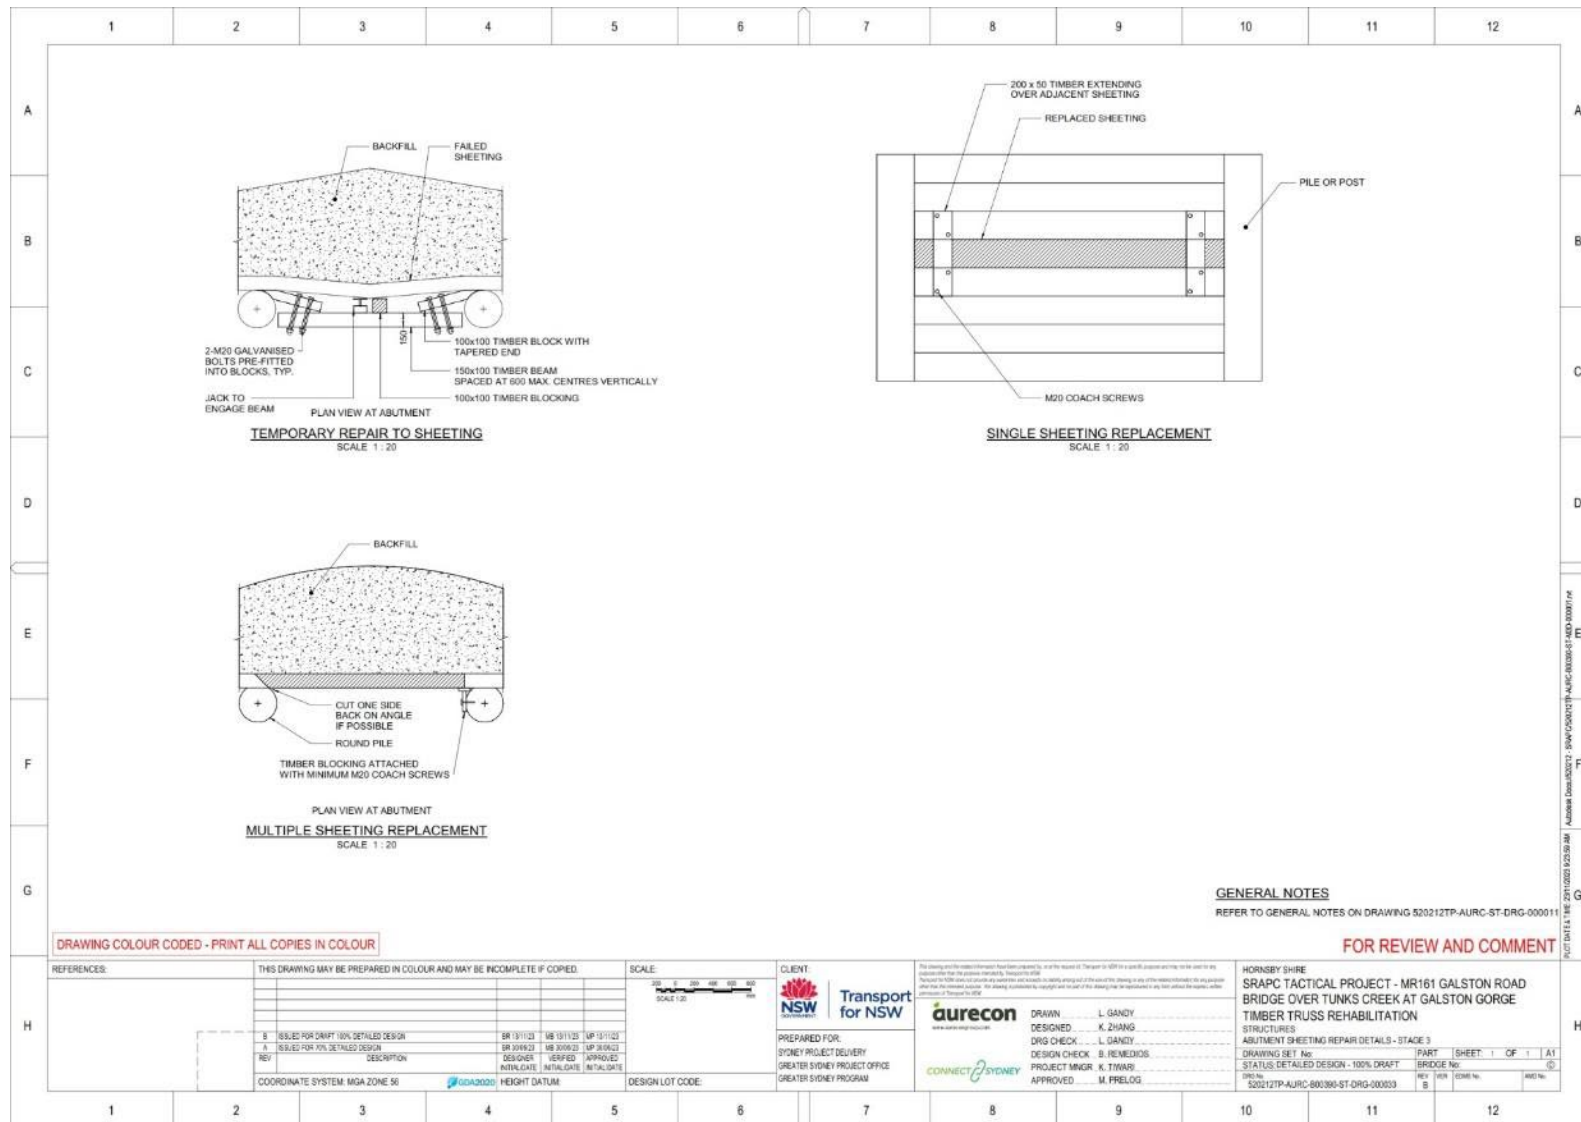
Structures abutment sheeting repair details – Stage 3: 520212TP-AURC-B00390-ST-DRG-000033 (Source: Aurecon)
